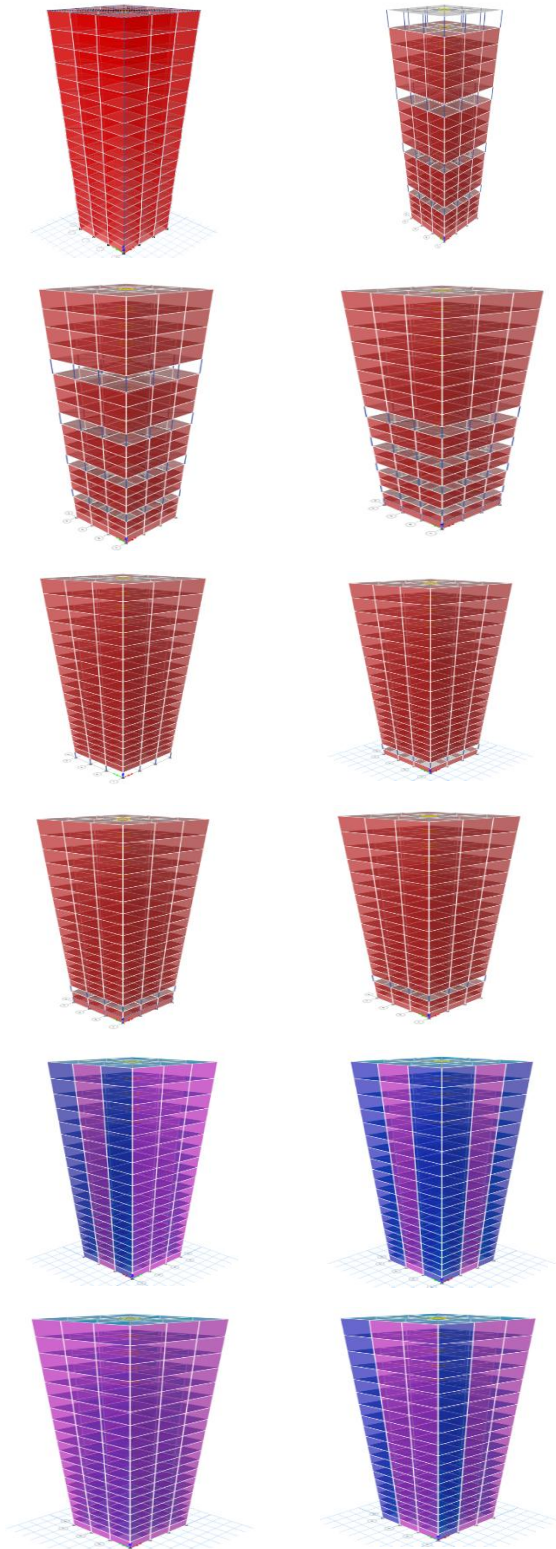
3D building models: (a) Infill frame; (b) Soft story 1; (c) Soft story 2; (d) Soft story 3; (e) Soft story 4; (f) Raft footing; (g) Soft story 5; (h) Soft story 6; (i) Soft story 7; (j) Soft story 8; (k to O) shear wall type 1 to 4
